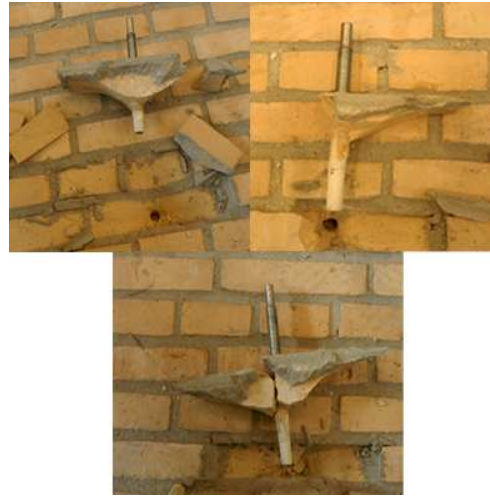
Brick-cone failures typically observed in masonry
